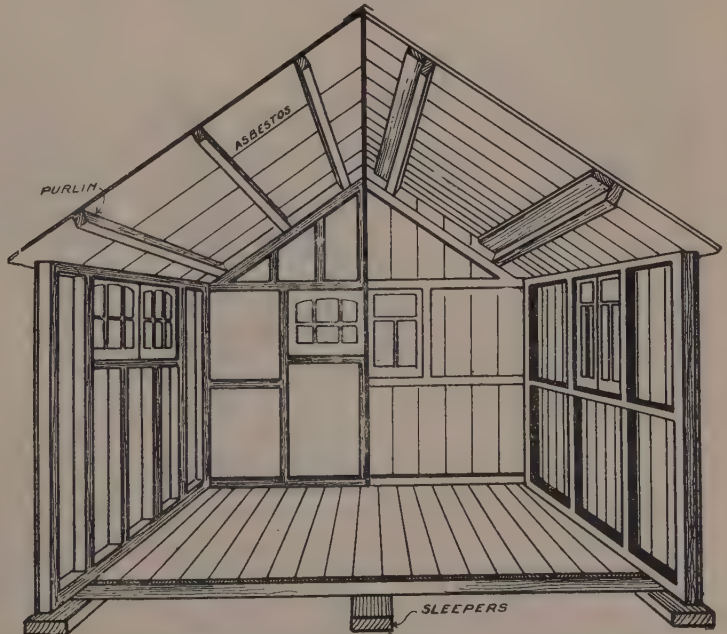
ROOF FRAMING AND FLOOR ARRANGEMENT.
